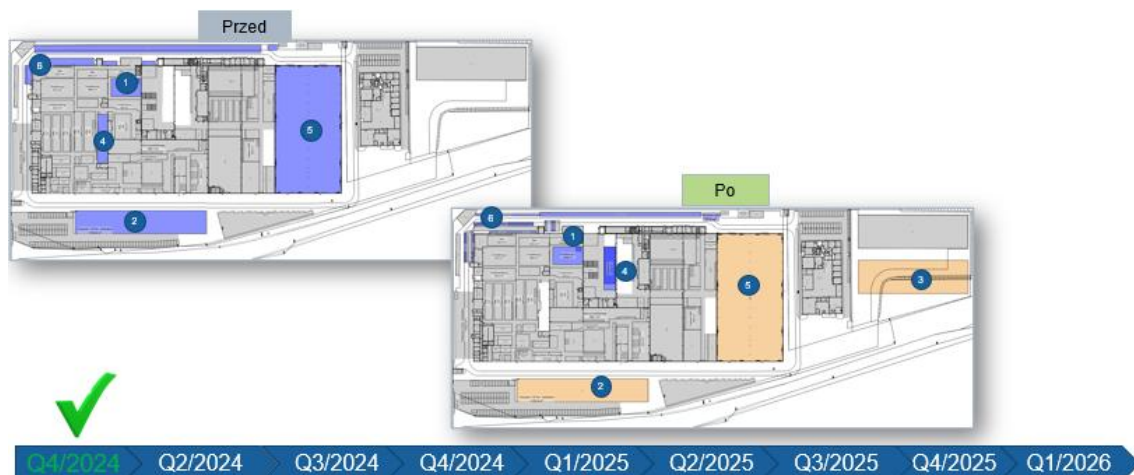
Reconstruction Plan - Stage I: 1-Addition of a new enamel mixer; 2-Start of reconstruction of the semi-finished product warehouse tent; 3-Start of construction of a temporary storage tent; 4 - Transfer of paint shop; 5 - Pouring the floor in halls 7 and 8 (concrete bond approx. 100 days); 6 - Construction of a rack warehouse for enameled tanks + fire wall.
